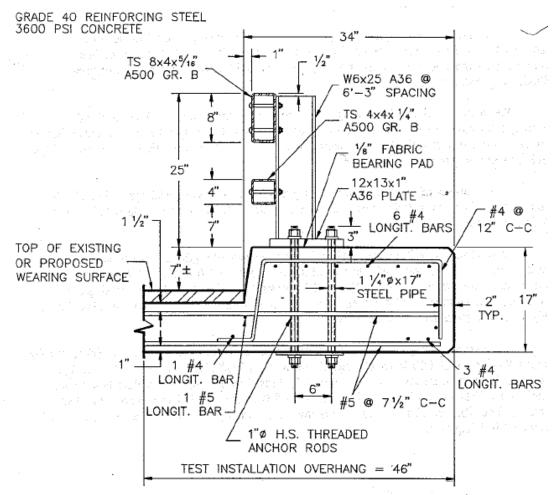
Cross Section of Illinois 2399-1 Bridge Railing
